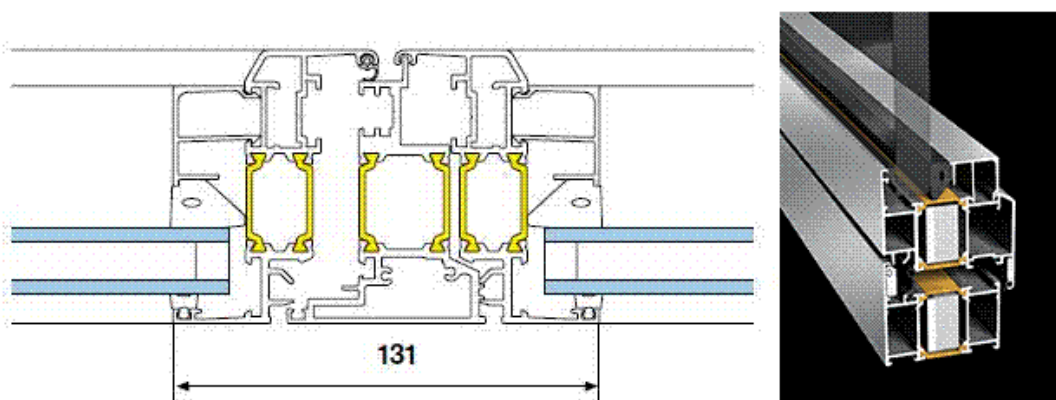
Section and general view of SAPA 1075 system which could be reinforced with steel plates.
